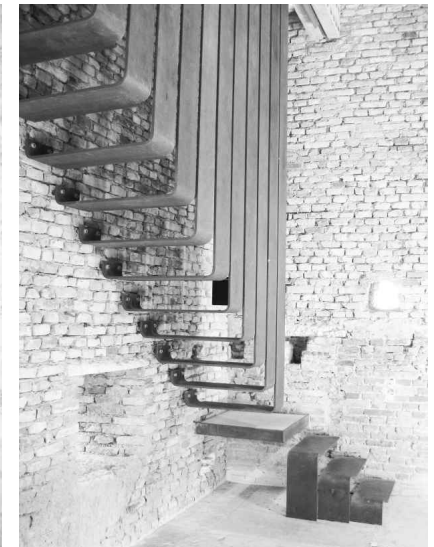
6.8. Scarpa's steel stair connection detail. (centralbranchlibrary.com:2010)
